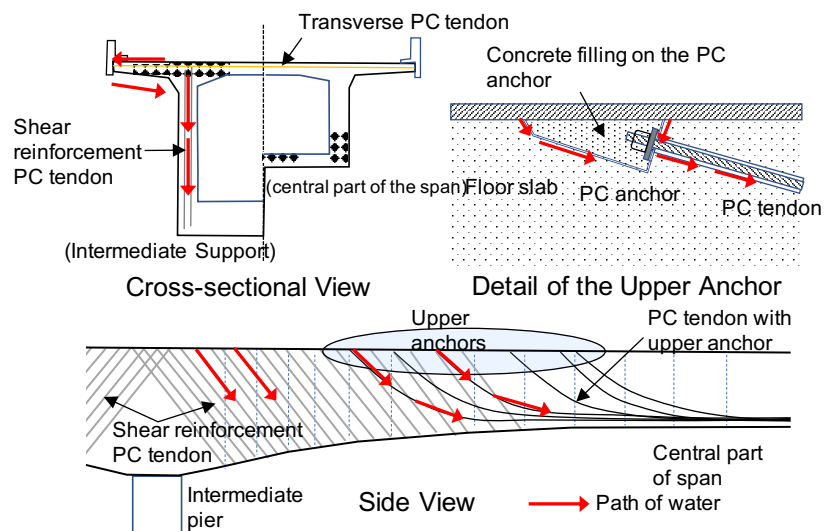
Arrangement of PC Steel and Water Leakage Pathways of PC Box Girder
